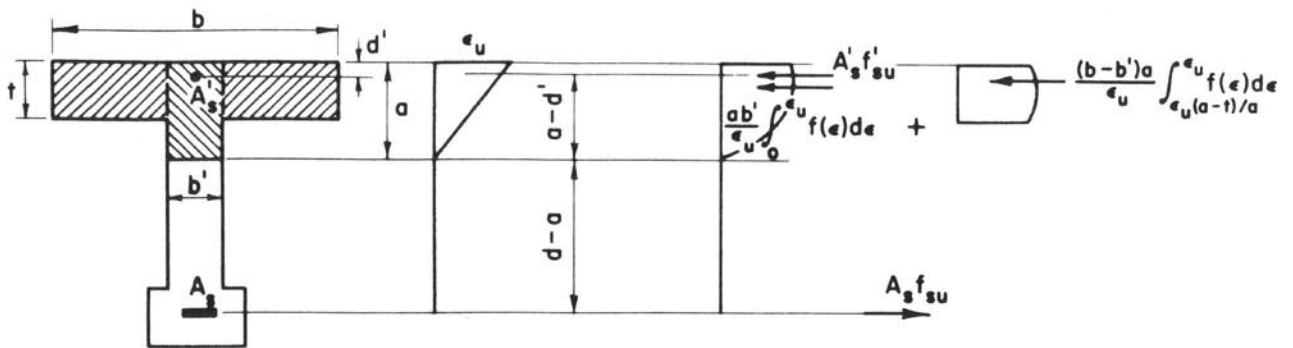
FLANGED SECTION, NEUTRAL AXIS BELOW THE FLANGE
